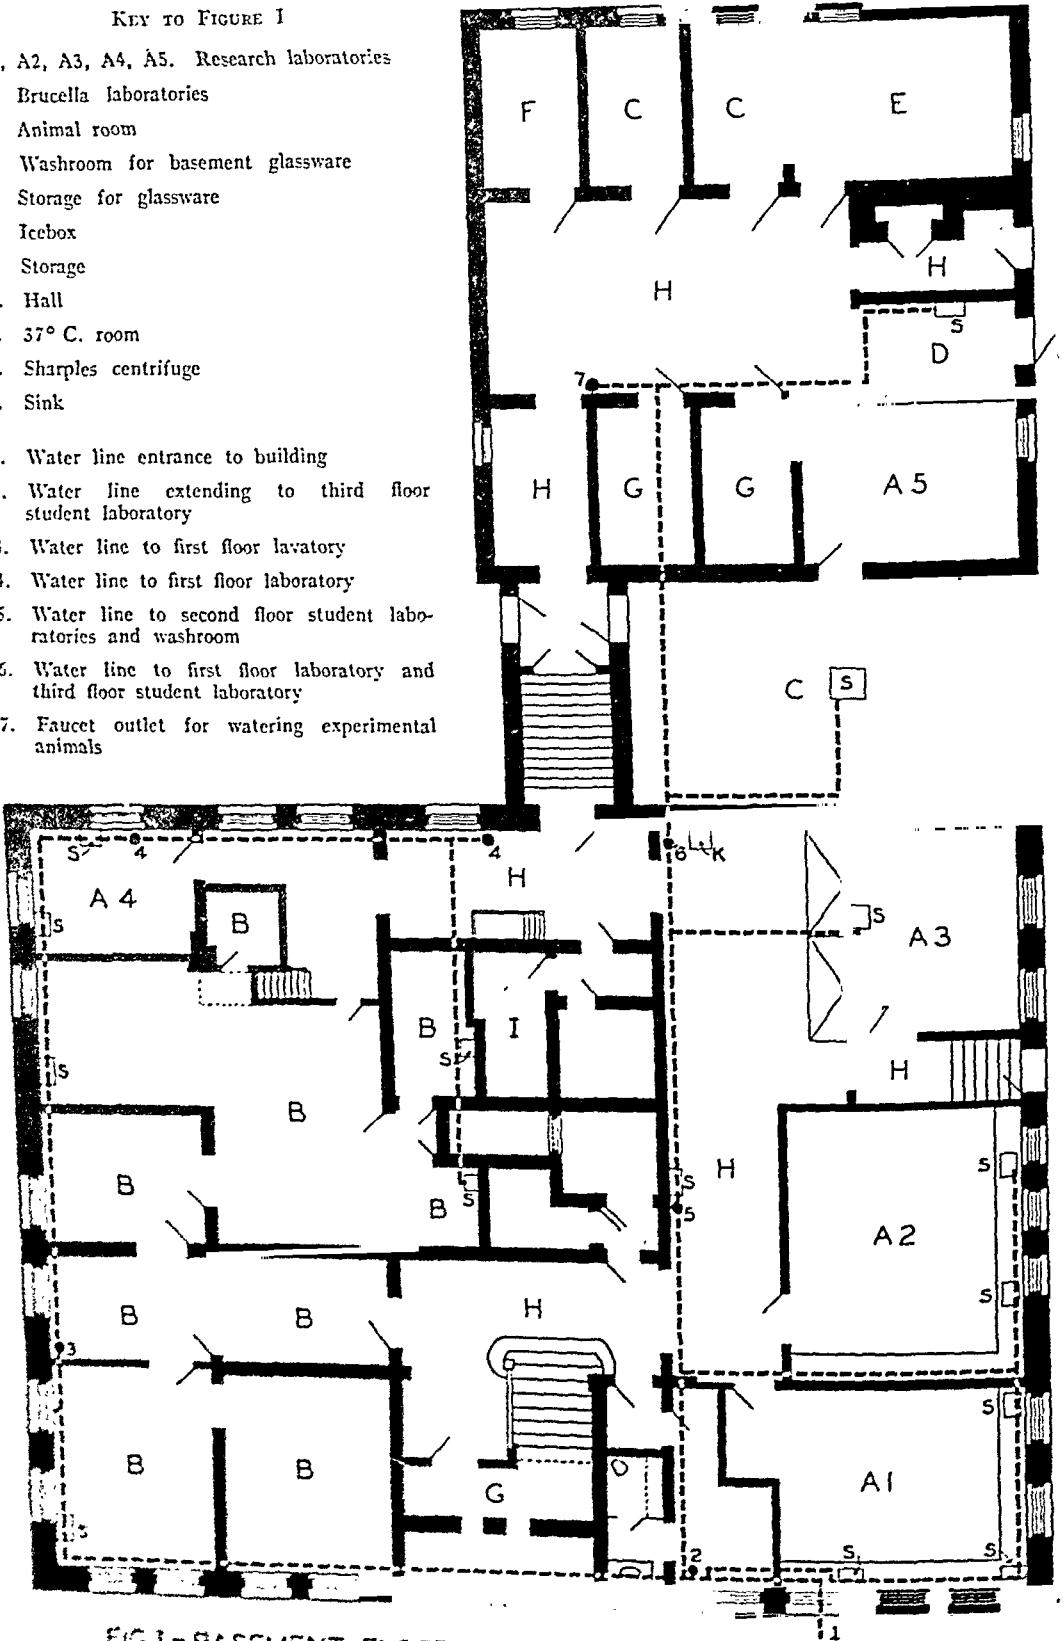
BASEMENT FLOOR PLAN OF BACTERIOLOGY BUILDING
